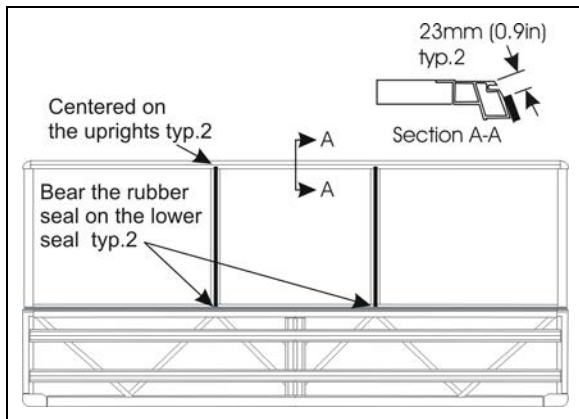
FACE FIXED WINDOWS - RUBBER SEAL INSTALLATION
